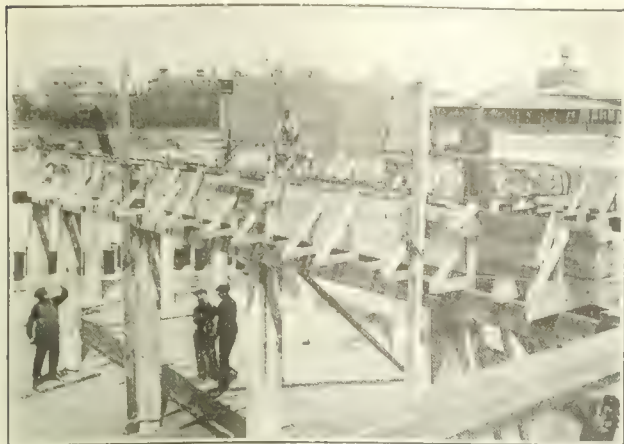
SETTING A GIRDER REINFORCING CRADLE
